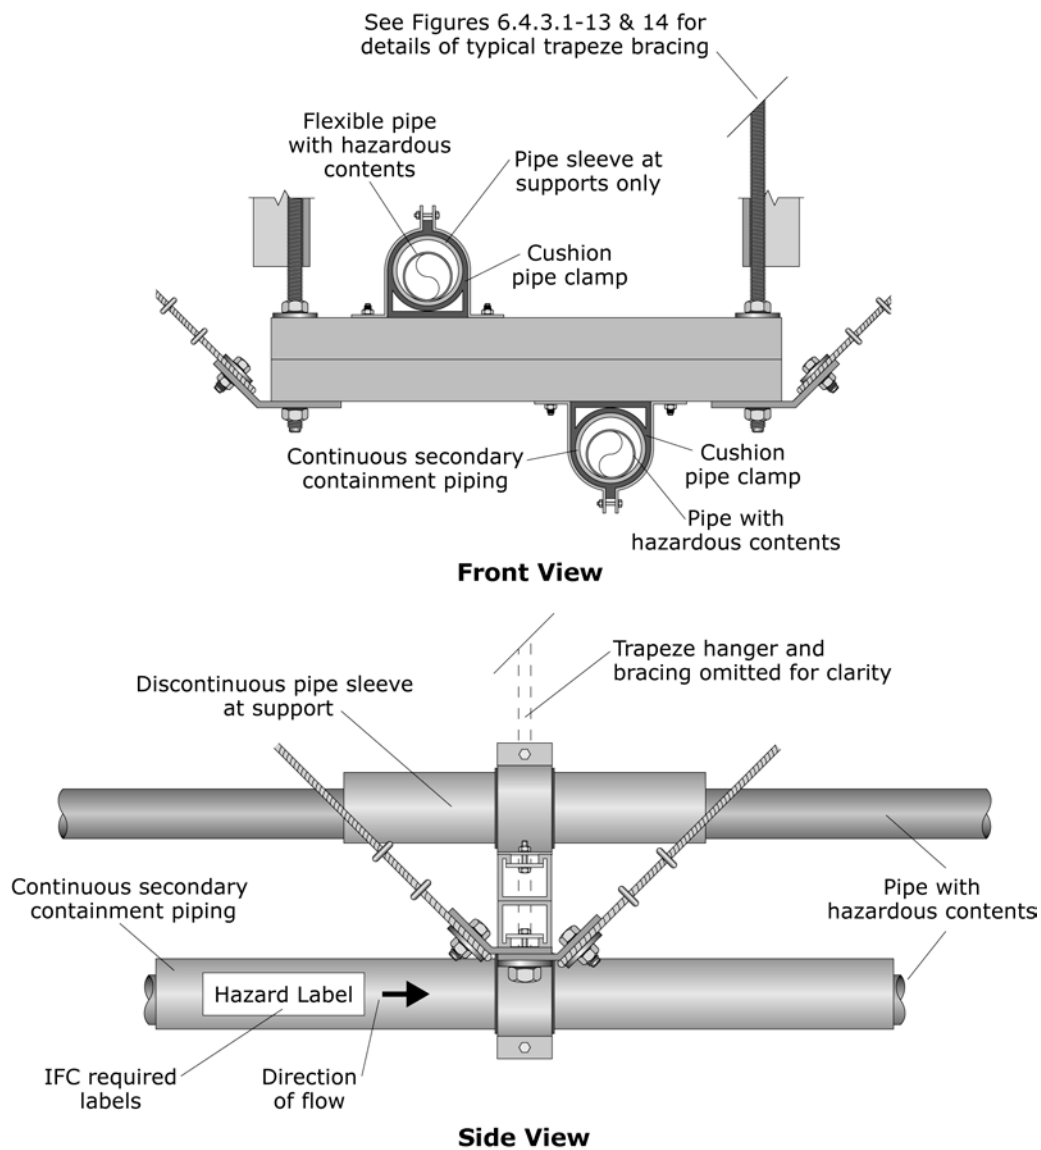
Hazardous piping examples (ER).
